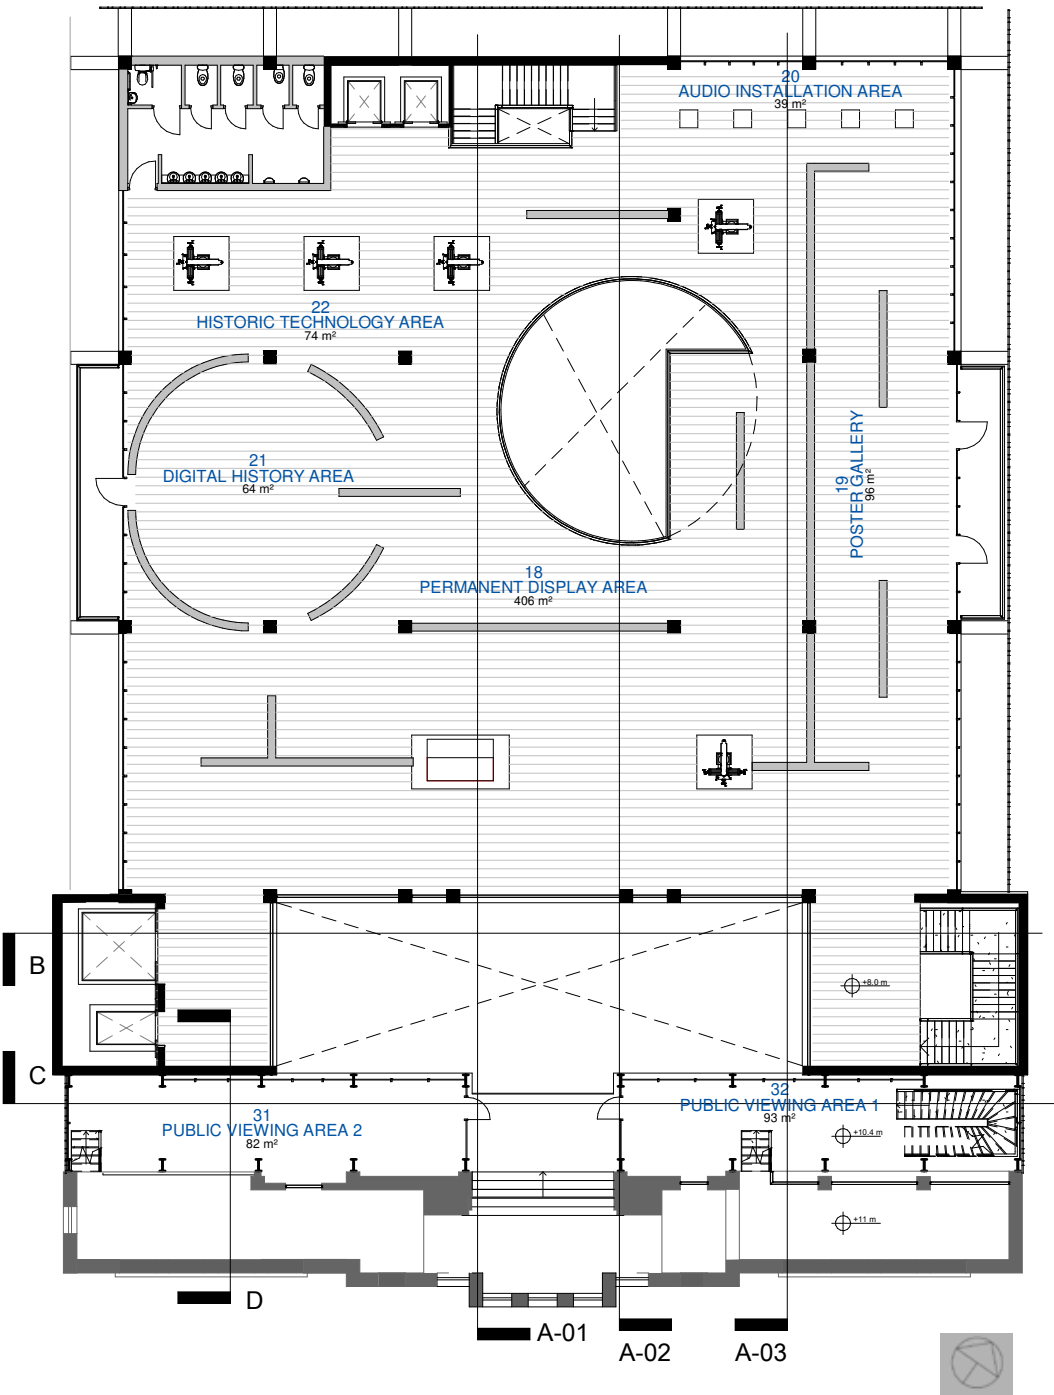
PROPOSED MUSEUM OF CINEMA - FIRST FLOOR PLAN -
